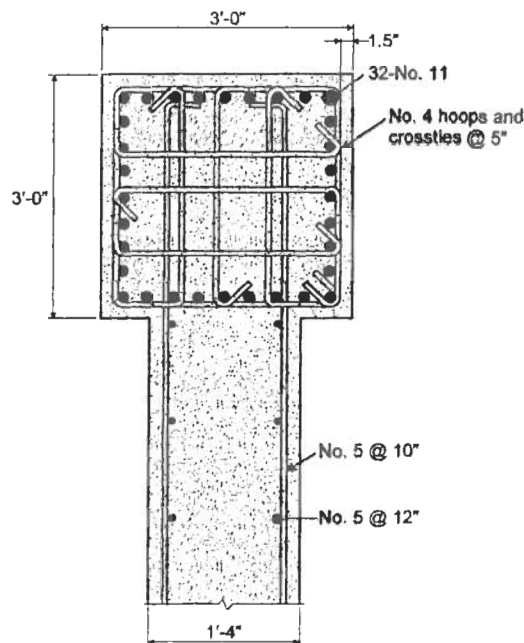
Reinforcement Details for Shear Wall Along Line 7 (SDC D)
